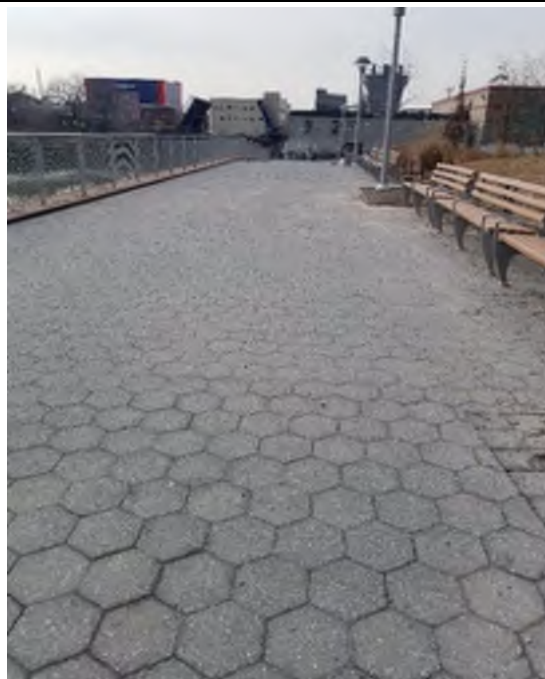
1st Street sidewalk, facing southeast. 27 February 2019.
